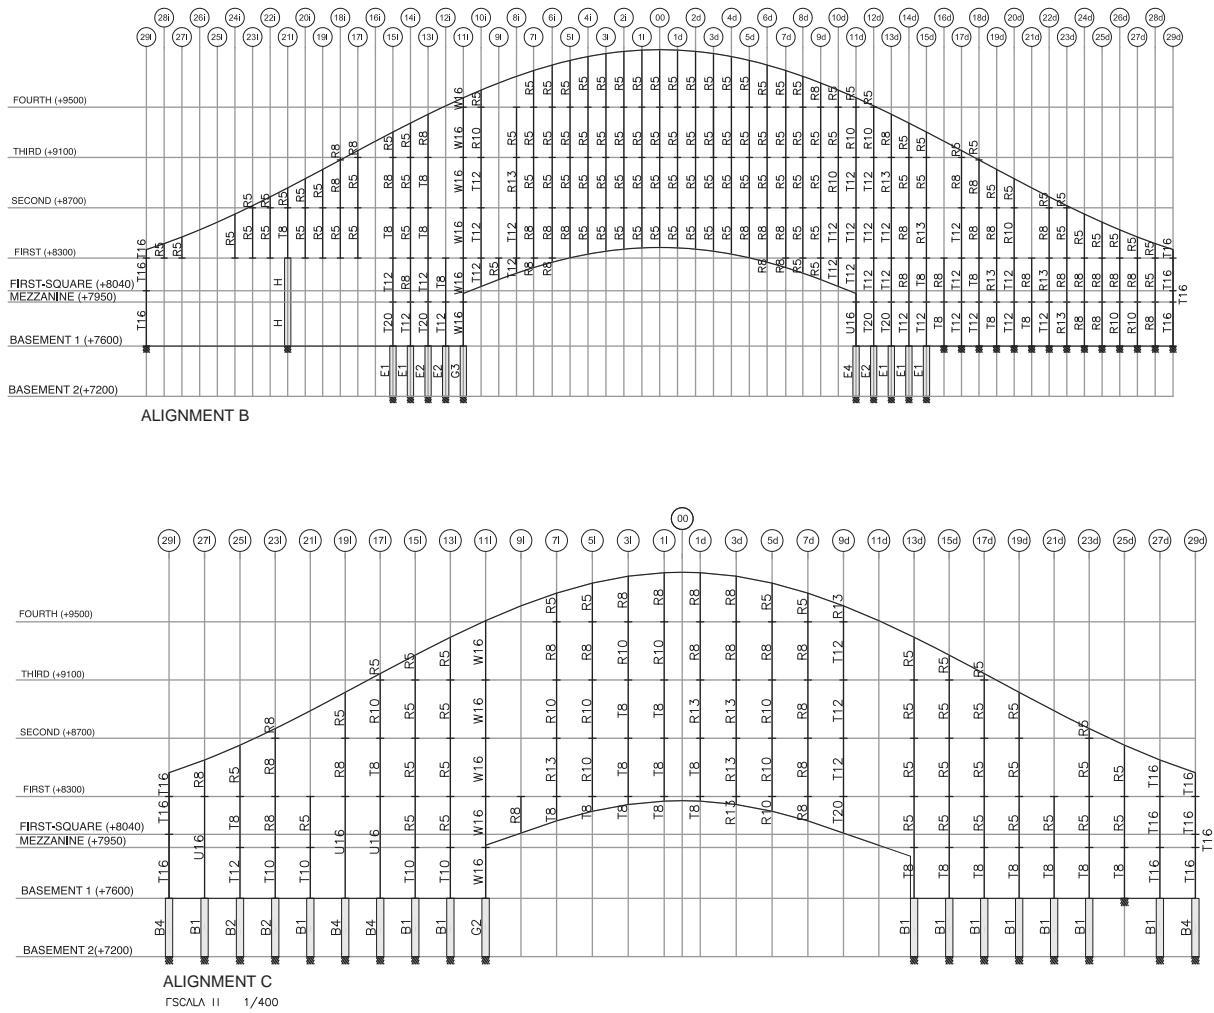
Elevation views of outer (alignment B) and inner (alignment C) columns.
